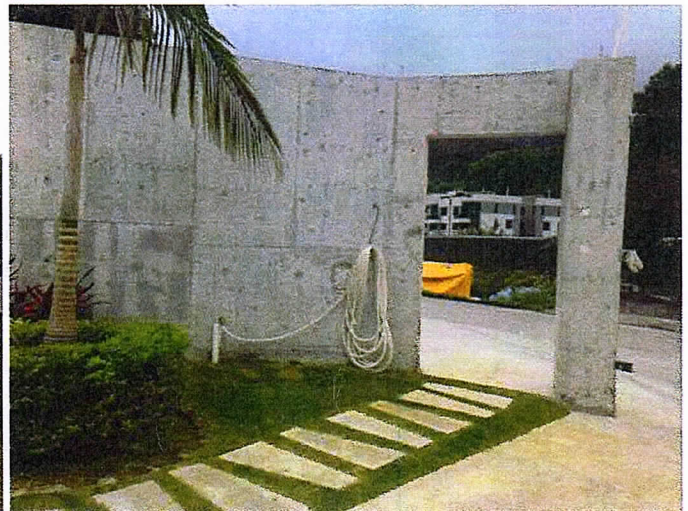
The Pedestrian Entrance in the immediate Left of the Application Site
